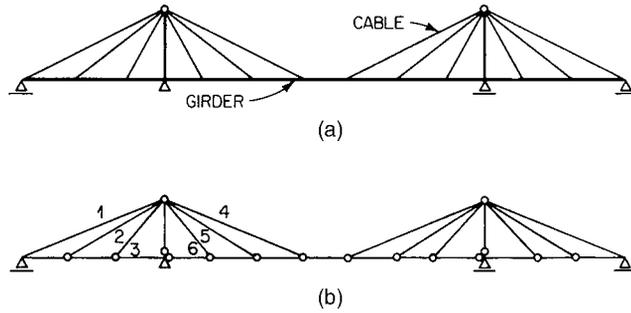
Cable-stayed bridge with three spans. (a) Girder is continuous over the three spans. (b) Insertion of hinges in the girder at cable attachments makes system statically determinate.
